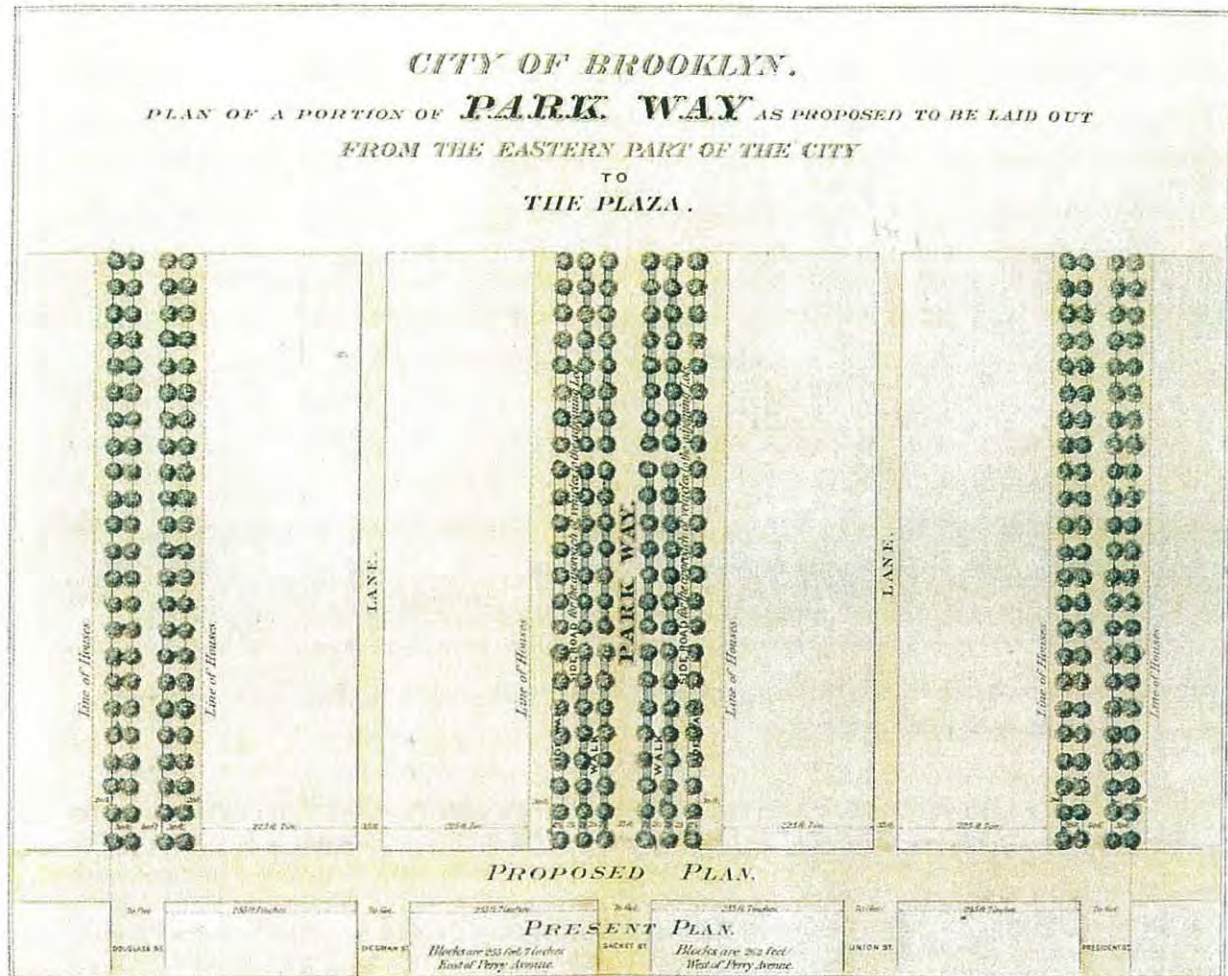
Plan of a Portion of Park Way as Proposed to be Laid Out from the Eastern Part of the City to the Plaza, City of Brooklyn, 1868. FLONHS (Beveridge and Rocheleau).
